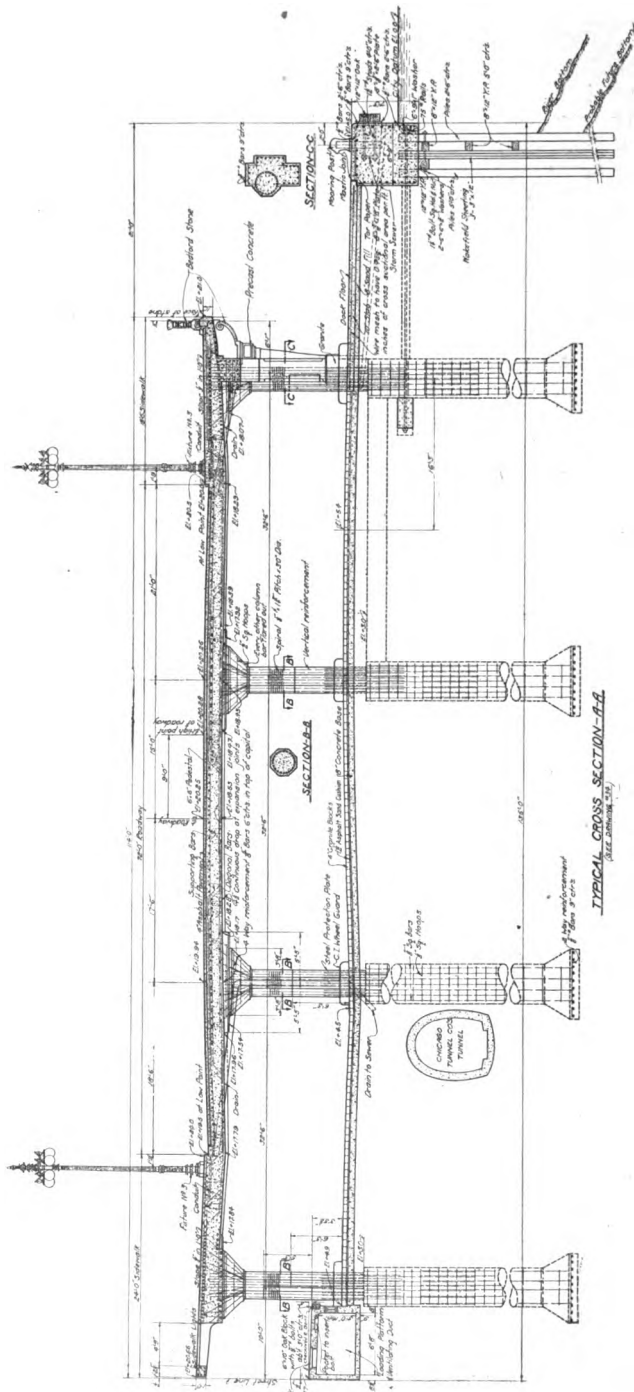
TYPICAL CROSS SECTION—STATE STREET TO FRANKLIN STREET.
